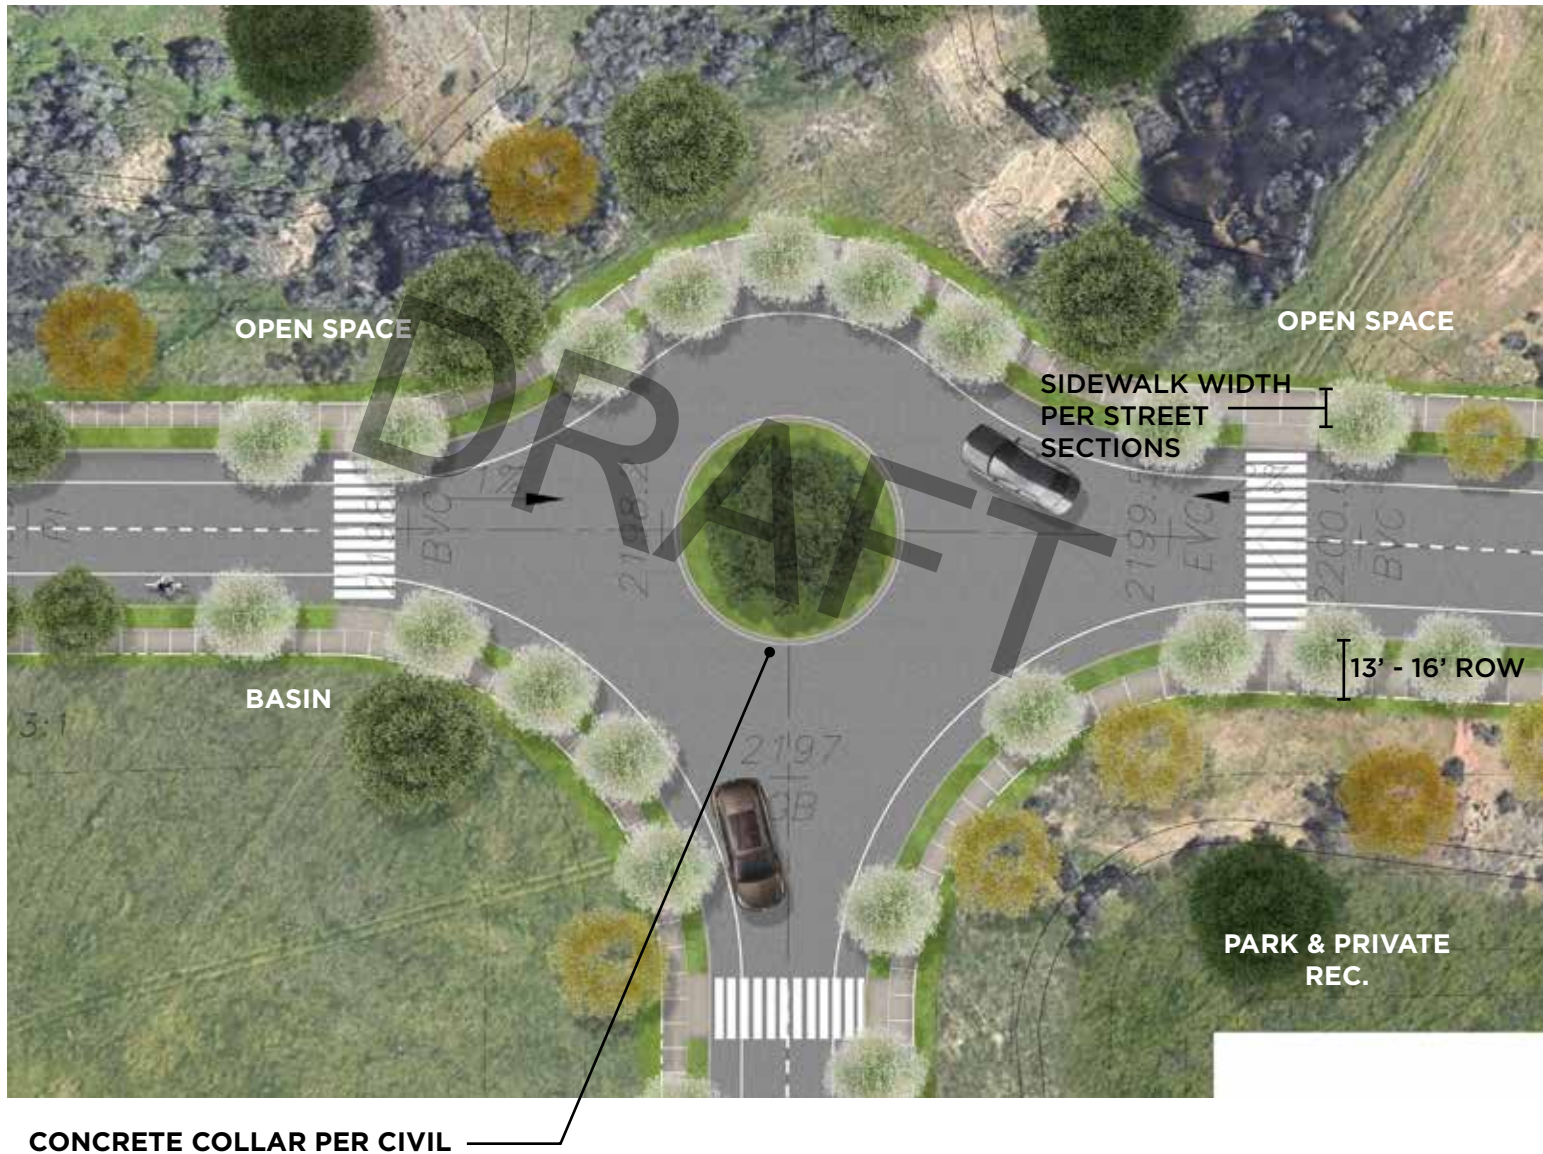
TYPICAL ROUNDABOUT VIGNETTE
